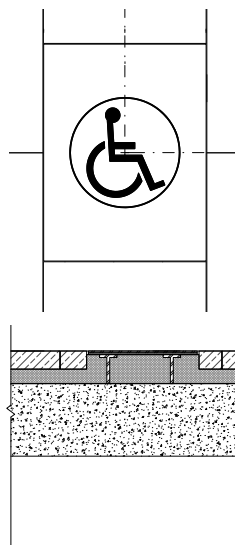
CSELR example of a typical platform plan and typical platform section
